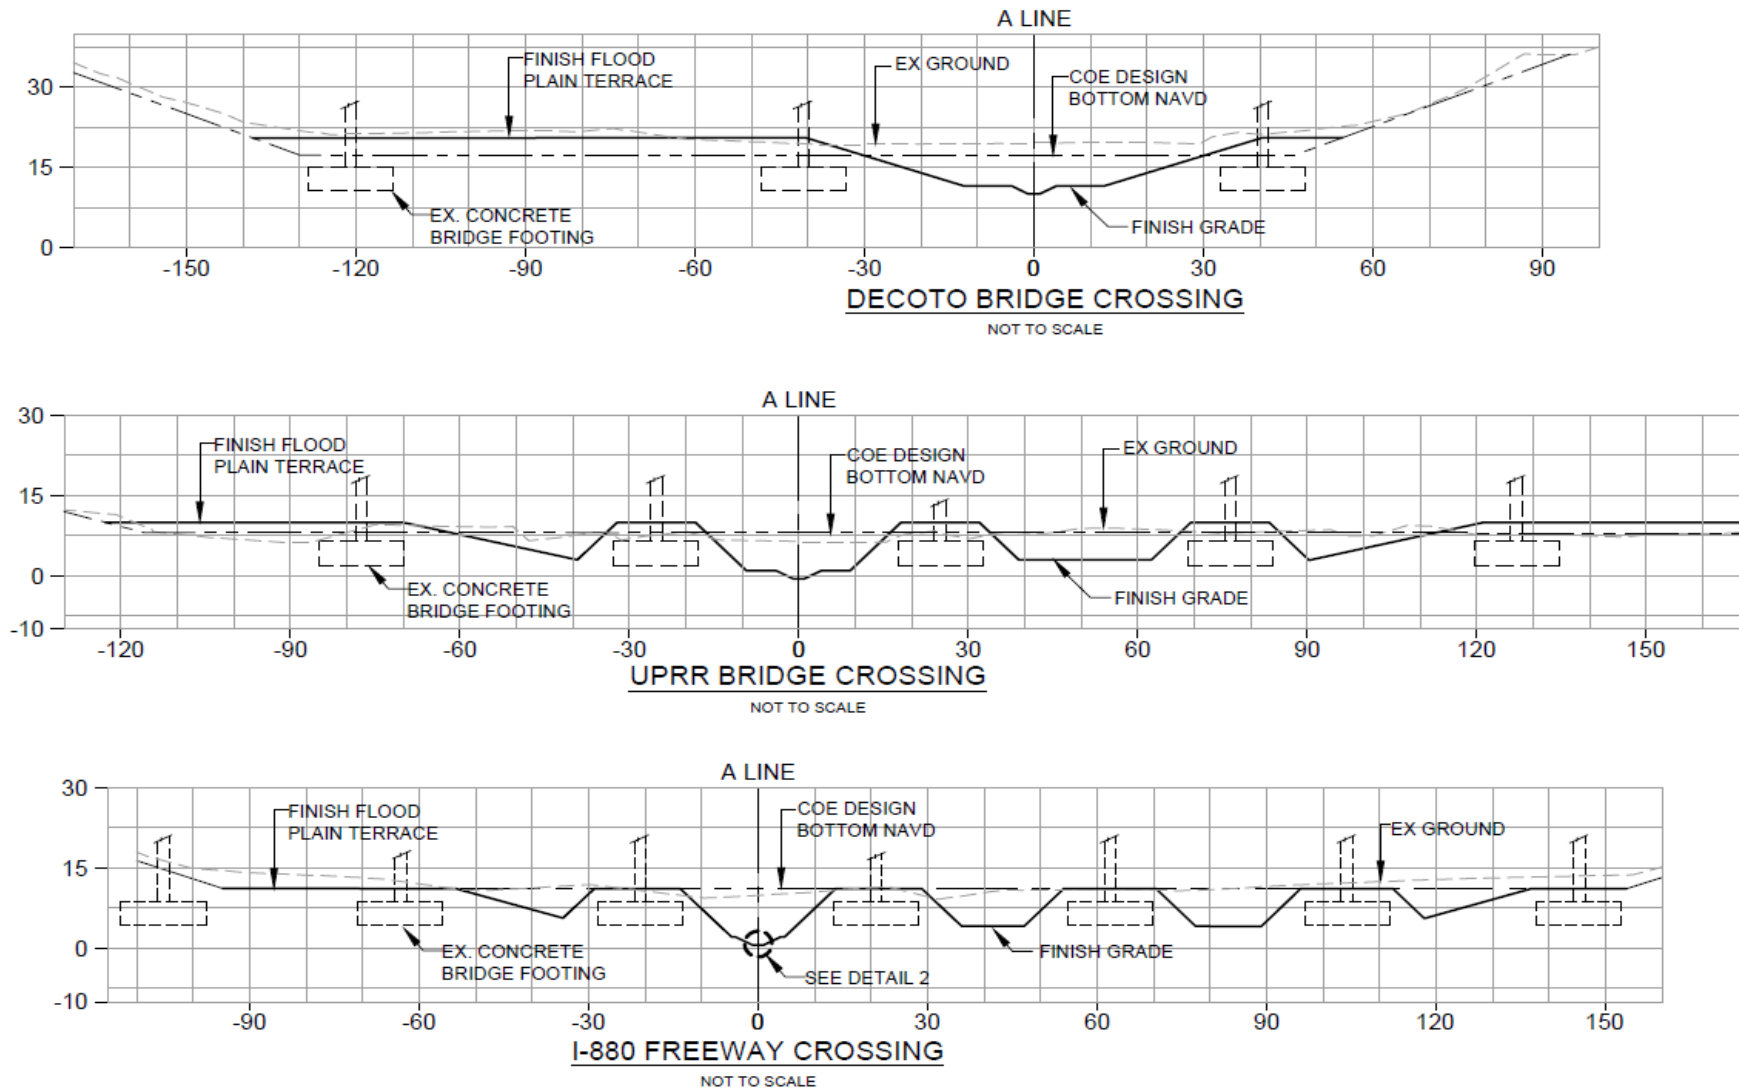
C. Cross-Section View of the Modified Channel at Bridge Crossings
